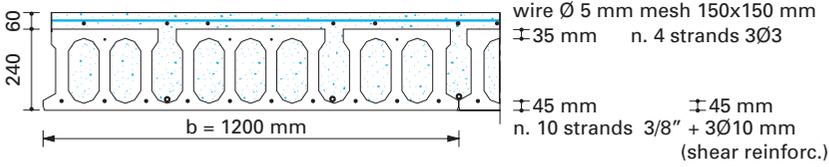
Cross section at the support of hollow core floor $h = 240$ mm with concrete topping 60 mm thick
